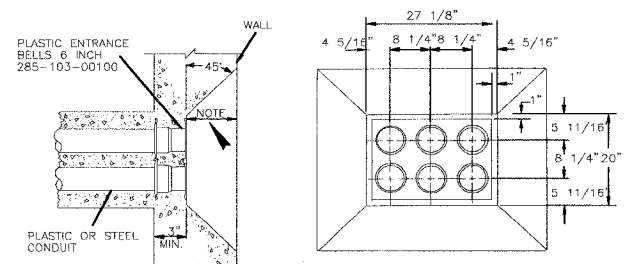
MANHOLE ENTRANCE WITH PLASTIC TERMINATORS (OLDER STYLE) FOR PLASTIC OR STEEL CONDUIT (POCKET TYPE)
